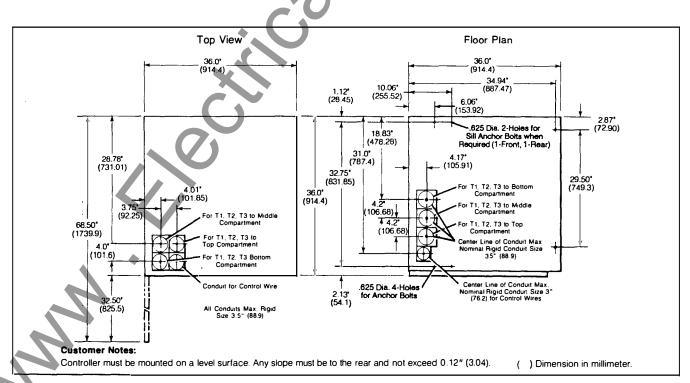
Top View and Typical Floor Plan with Bus Located in Top Compartment
